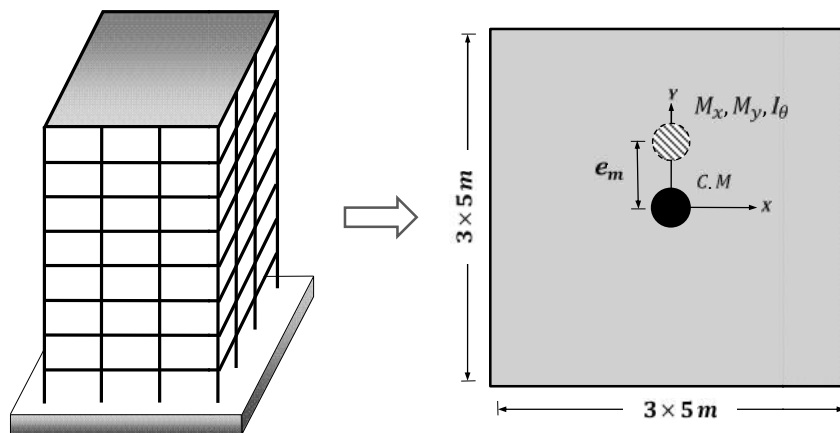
Typical 8-story mass eccentric building considered (Izadi-Z, 2014)
